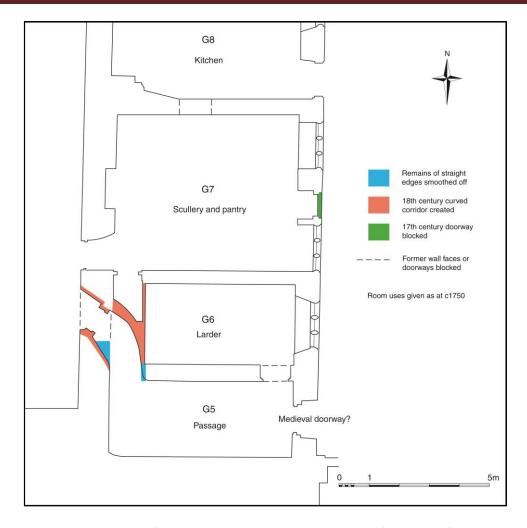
Plan of G5, G6 and G7 with excavated sequence (Andy Isham)
